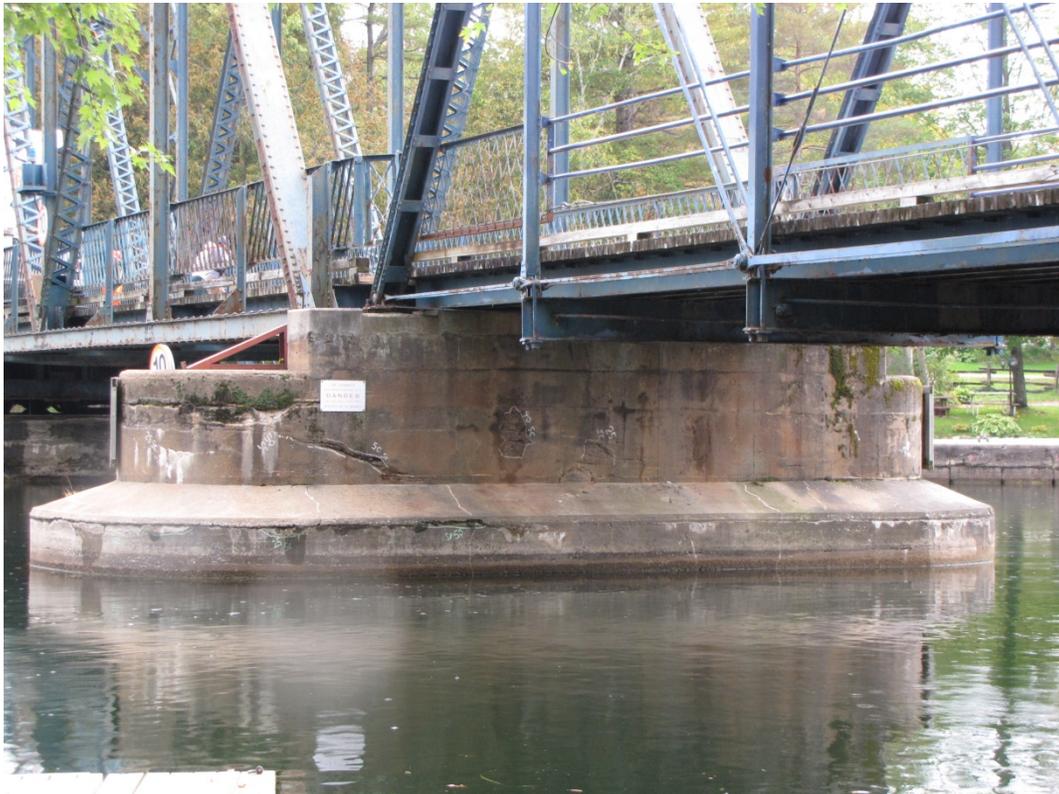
East face of the pier – numerous cracks, spalls and areas of disintegration noted.
